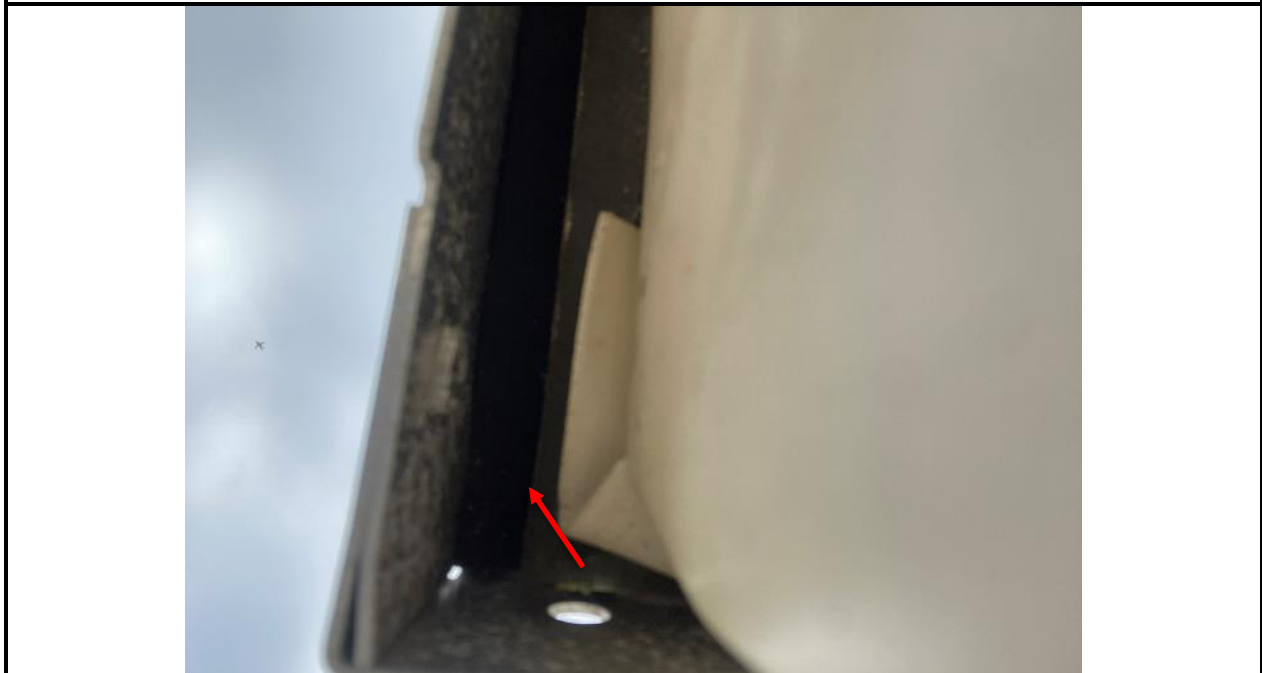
Metal cover at exhaust fan equipment curb (GRV-1) with unsealed fastener penetrations appears to be larger than necessary creating potential avenue for water infiltration.
